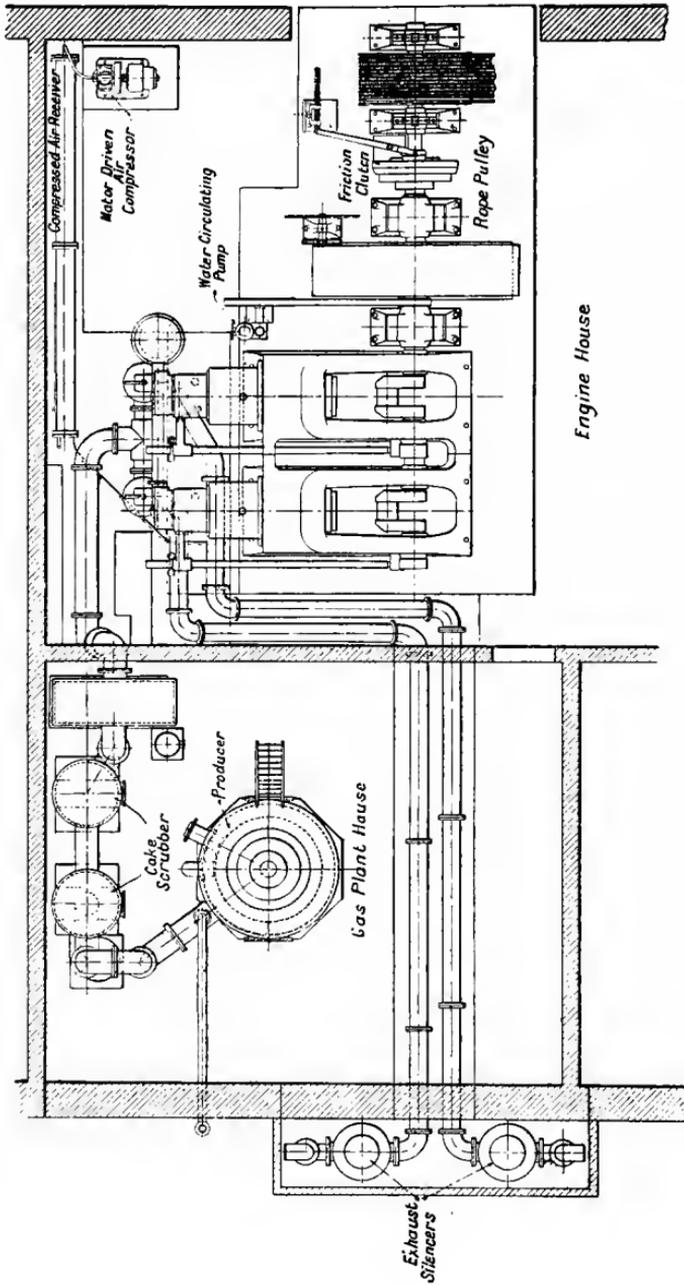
Arrangement of power house for 300 H.P. mill engine and suction gas producer.
